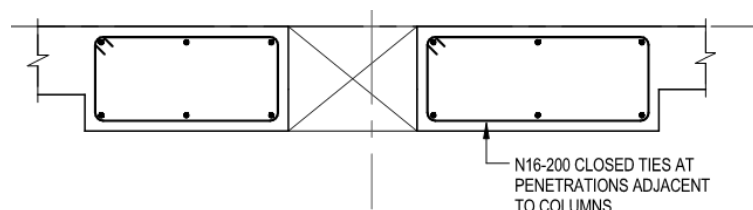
Allowance for future service riser zone adjacent to column – Alternative detail.
